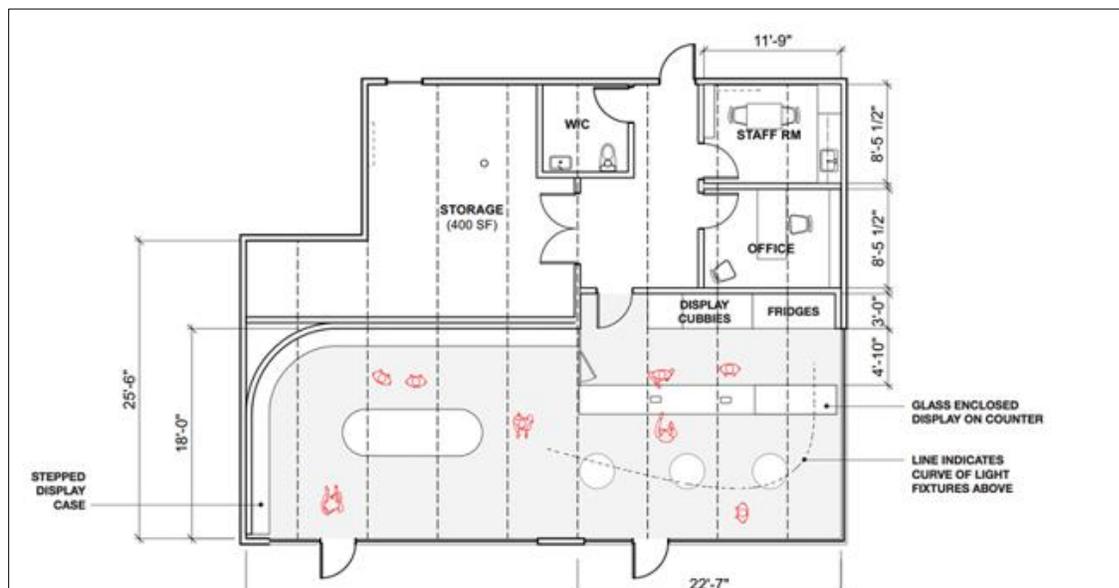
Amended Floor Plan (Unit #301 and Unit #302)
